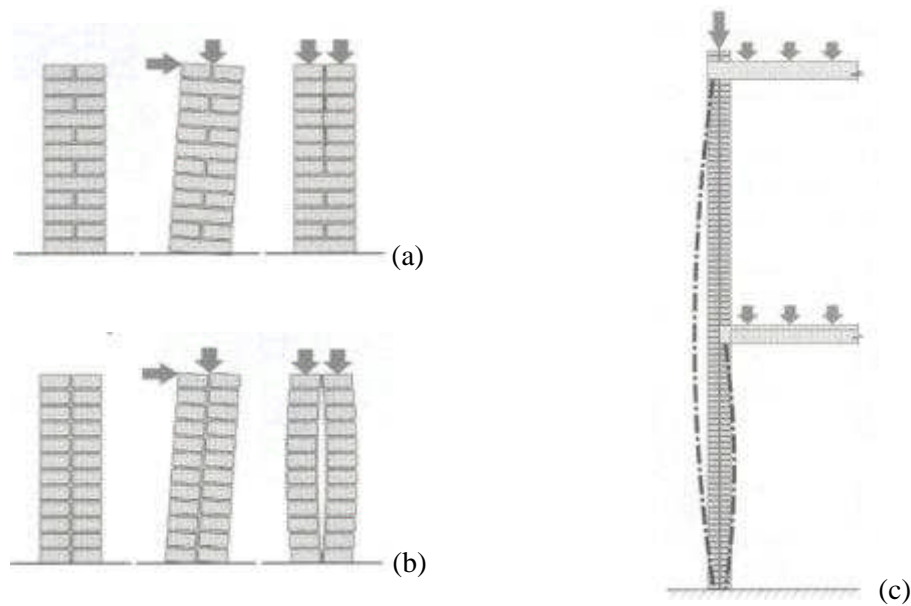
Behavior of single and multi-leaf masonries under loading: a) one leaf masonry, b) two leaf masonry, c) two leaf masonry in a multi-floor building.
